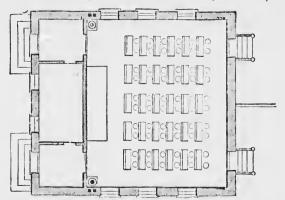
, - Ground Plan adapted to Figs. 70, 81, and, with modification, to 84 and 85,
